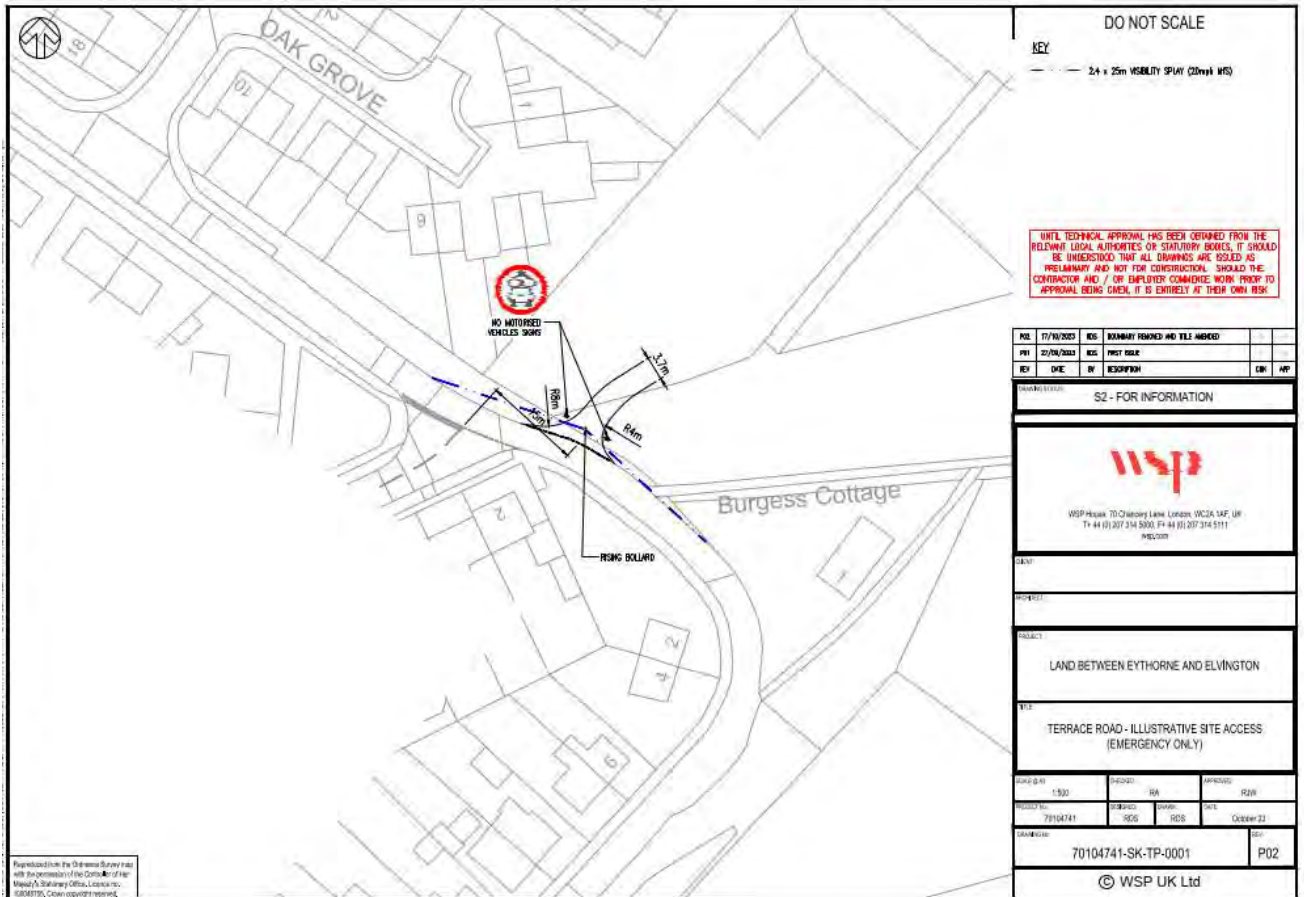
Terrace Road- Illustrative Site Access Arrangement (Emergency Only)
